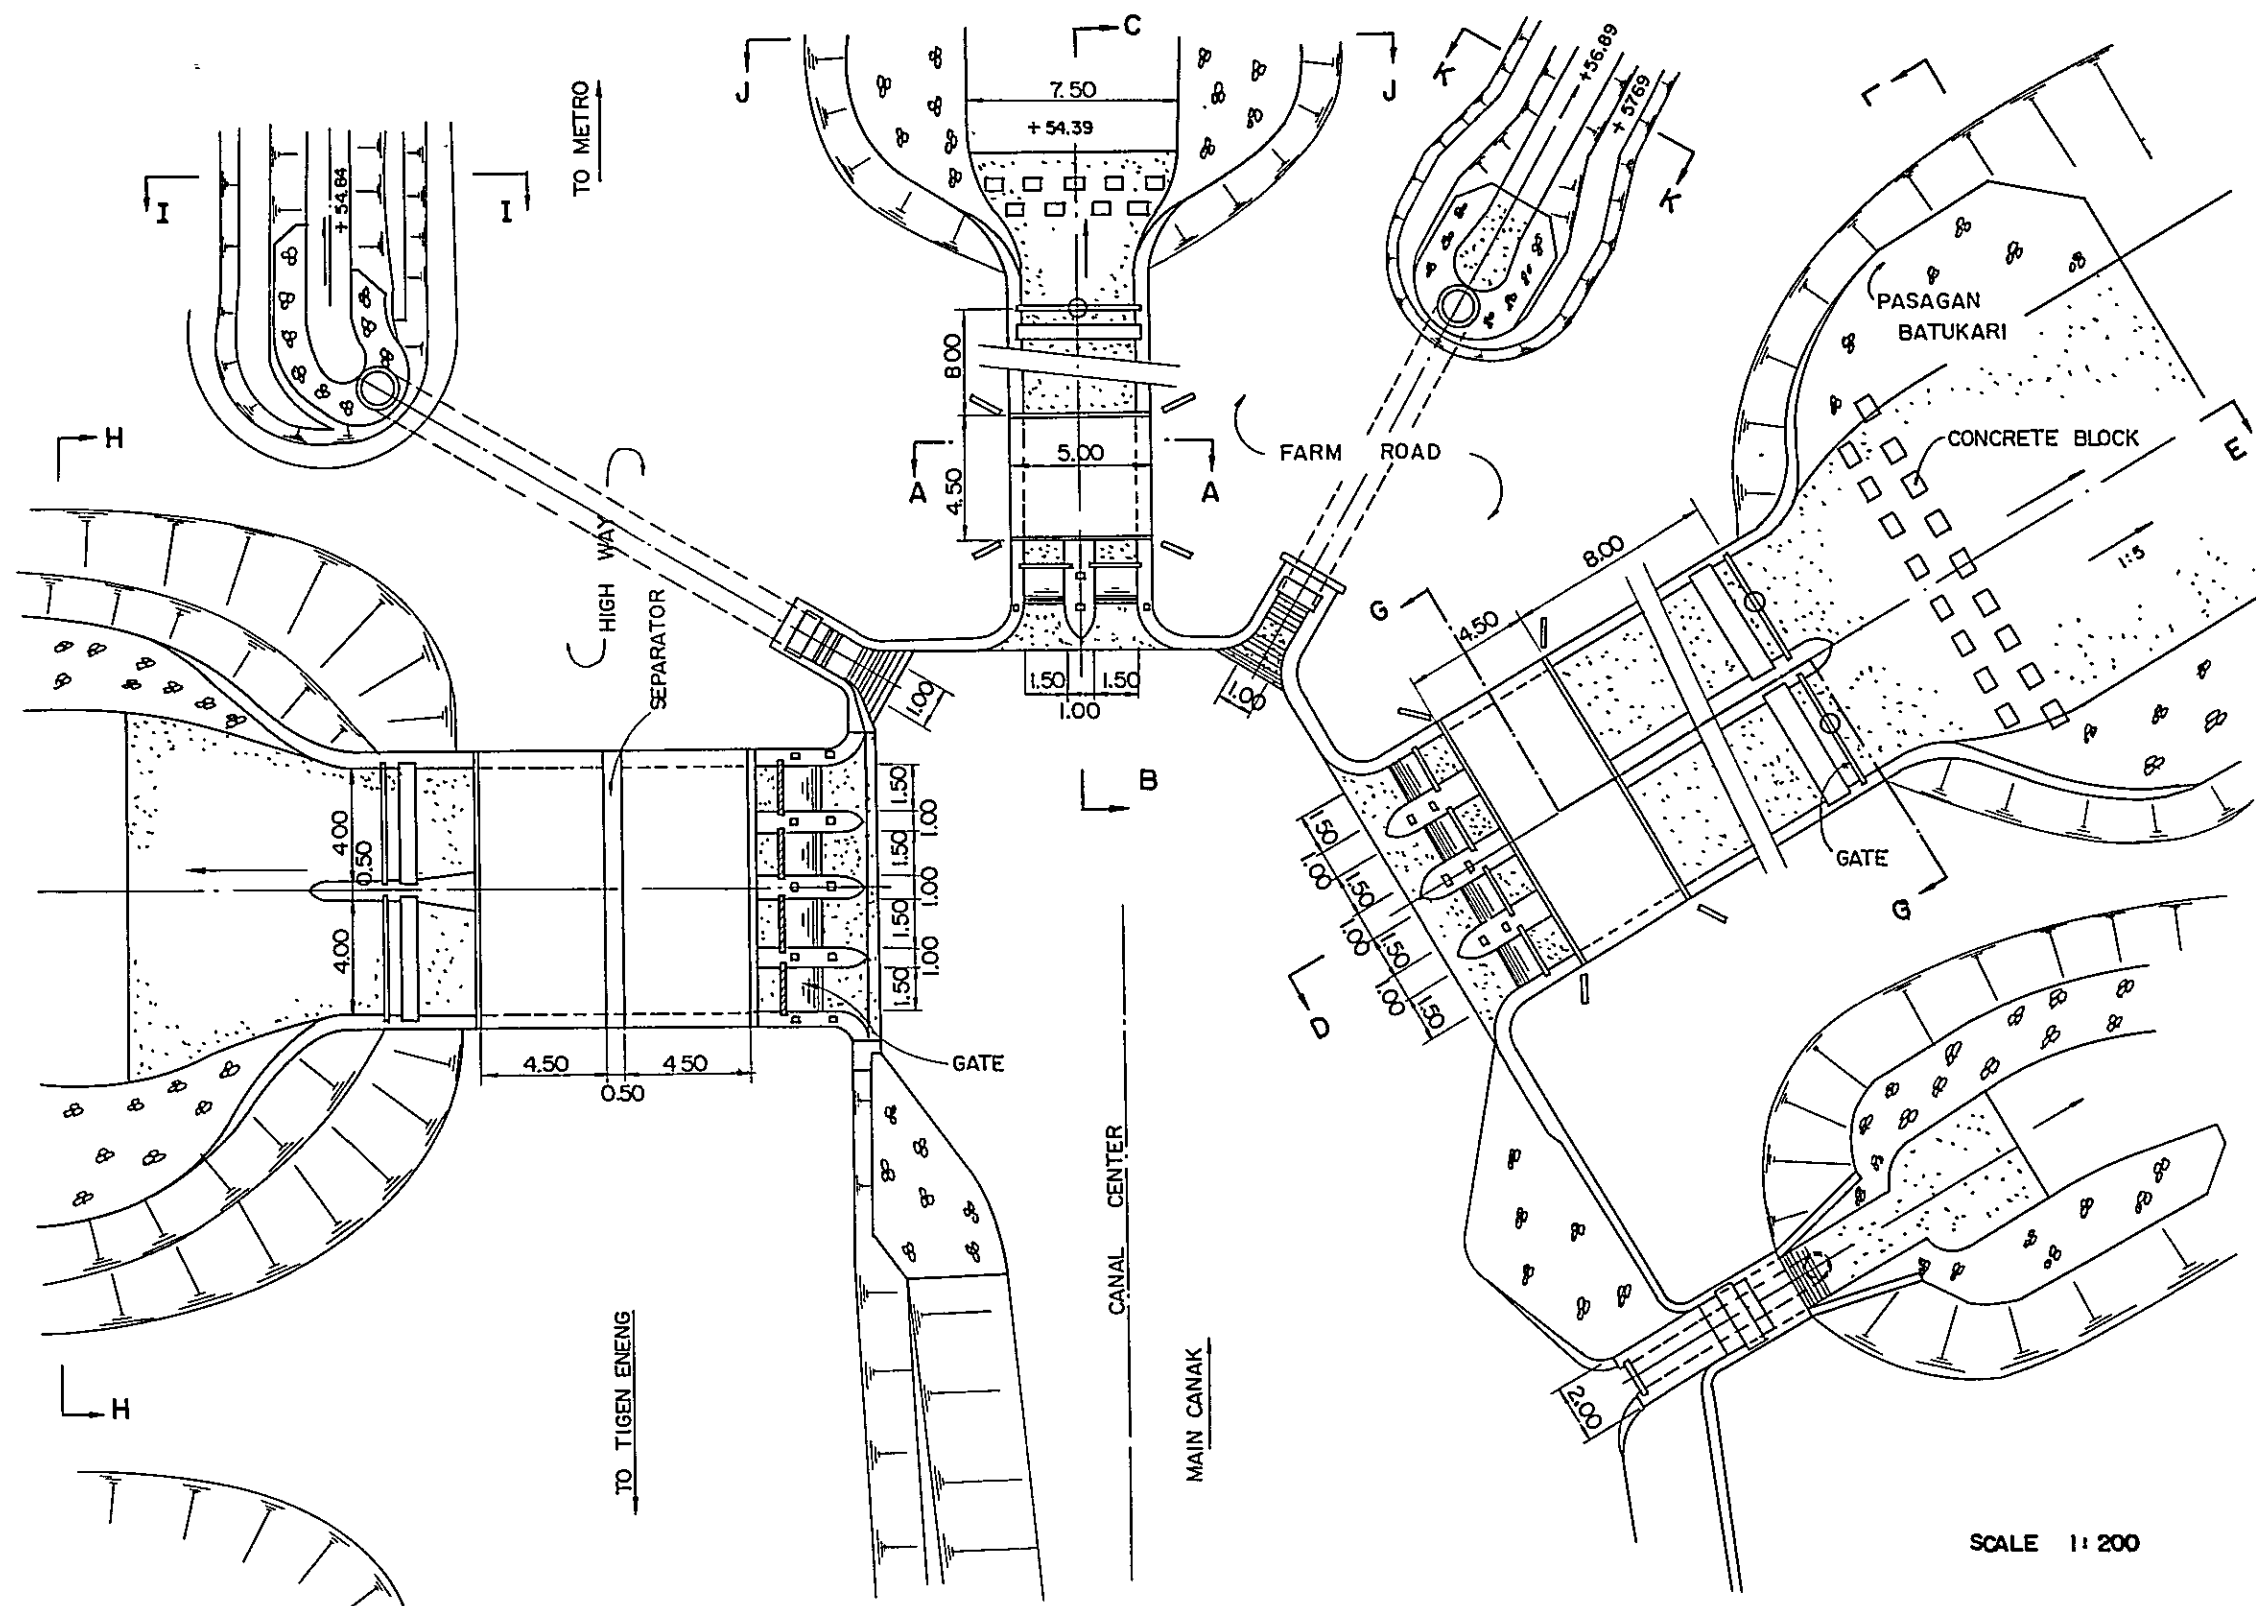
Plan of Turnout Facilities in Trimurdjo
